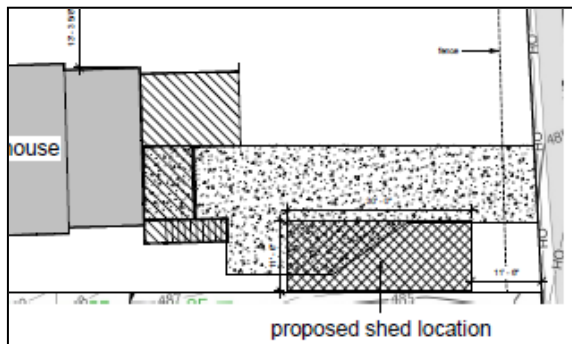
The outbuilding was installed at the edge of the property line with no setback.
